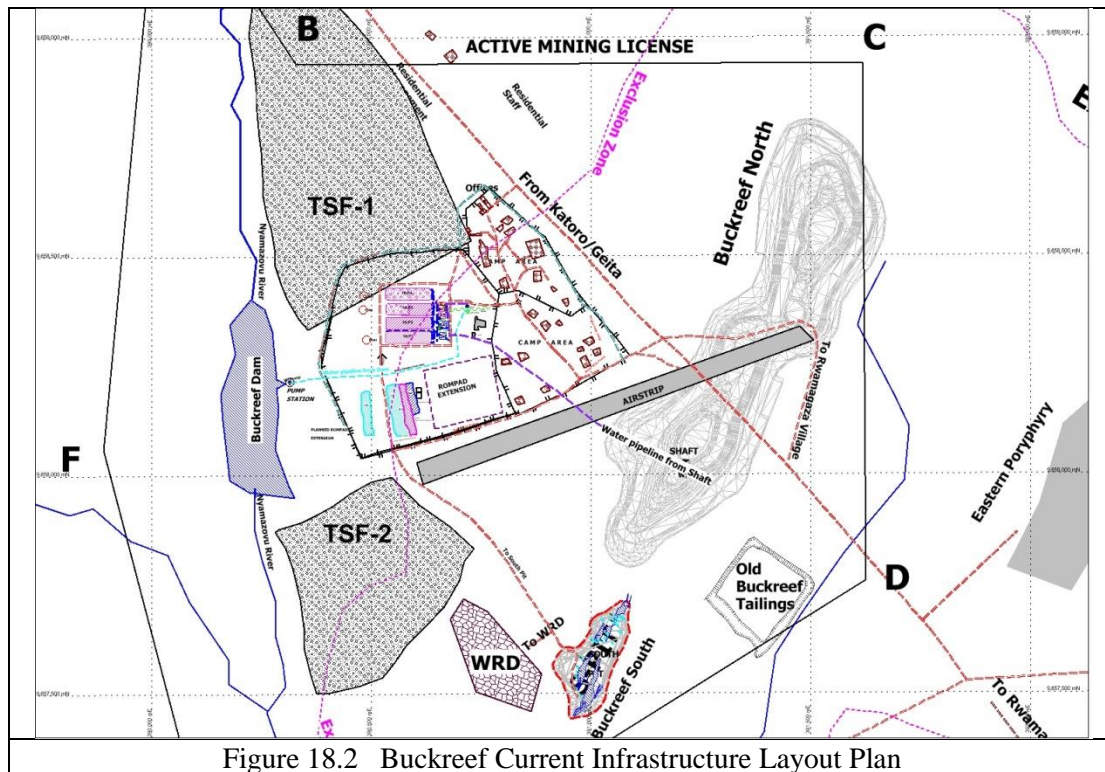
Buckreef Current Infrastructure Layout Plan
